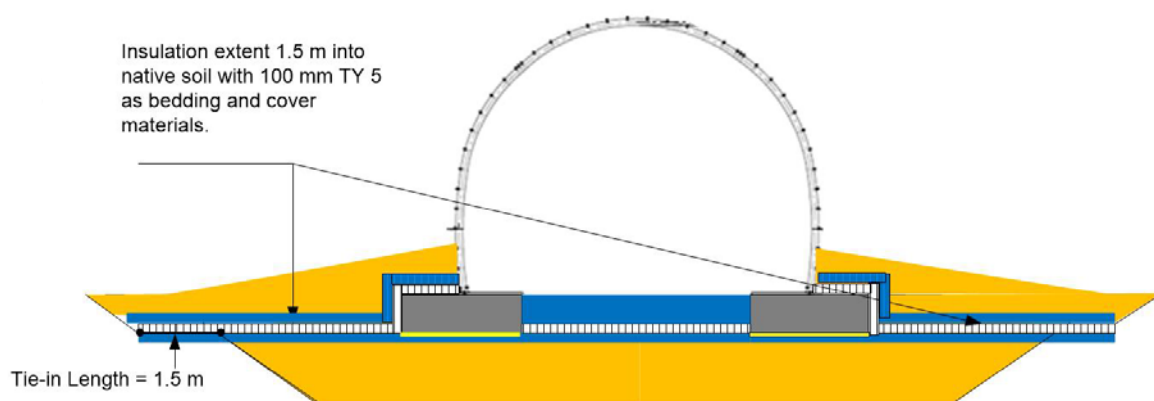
Insulation Pad Configuration (Cross Section) for Load-out Tunnel Segment near the Exit
